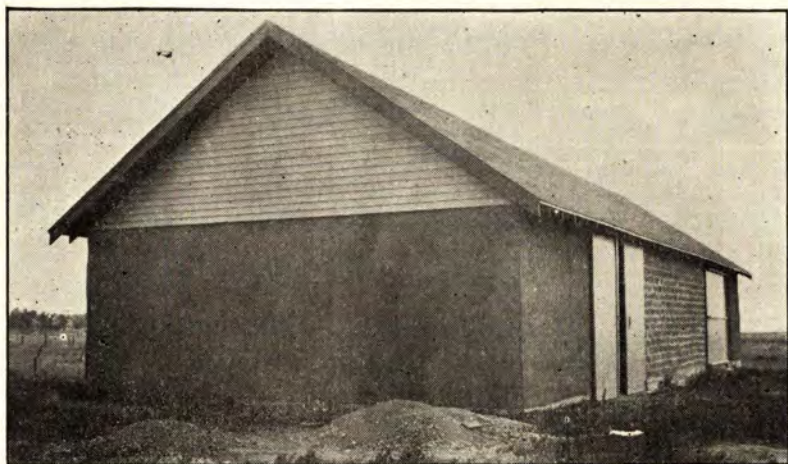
A MACHINE SHED WITH RAMMED EARTH WALLS AND A SECTION OF WALL BUILT OF BLOCKS.
